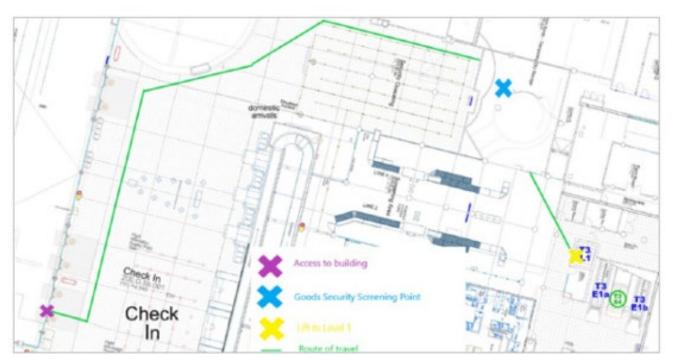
ENTRY – Ground floor to goods screening to Level 1
